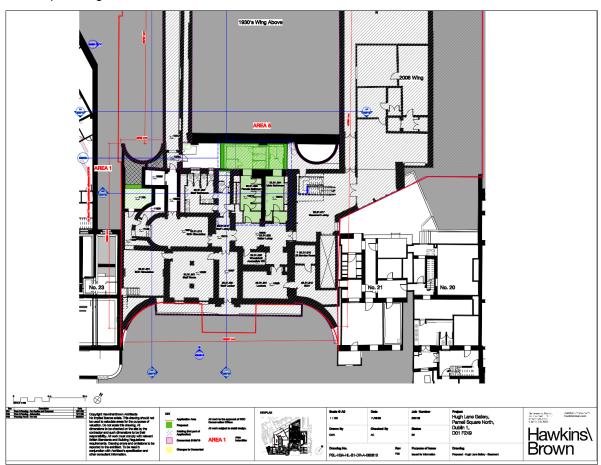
Extract from Proposed Basement Floor Plan (See Drawing No. PSL-HBA-HL-B1-DR-A-080610)
